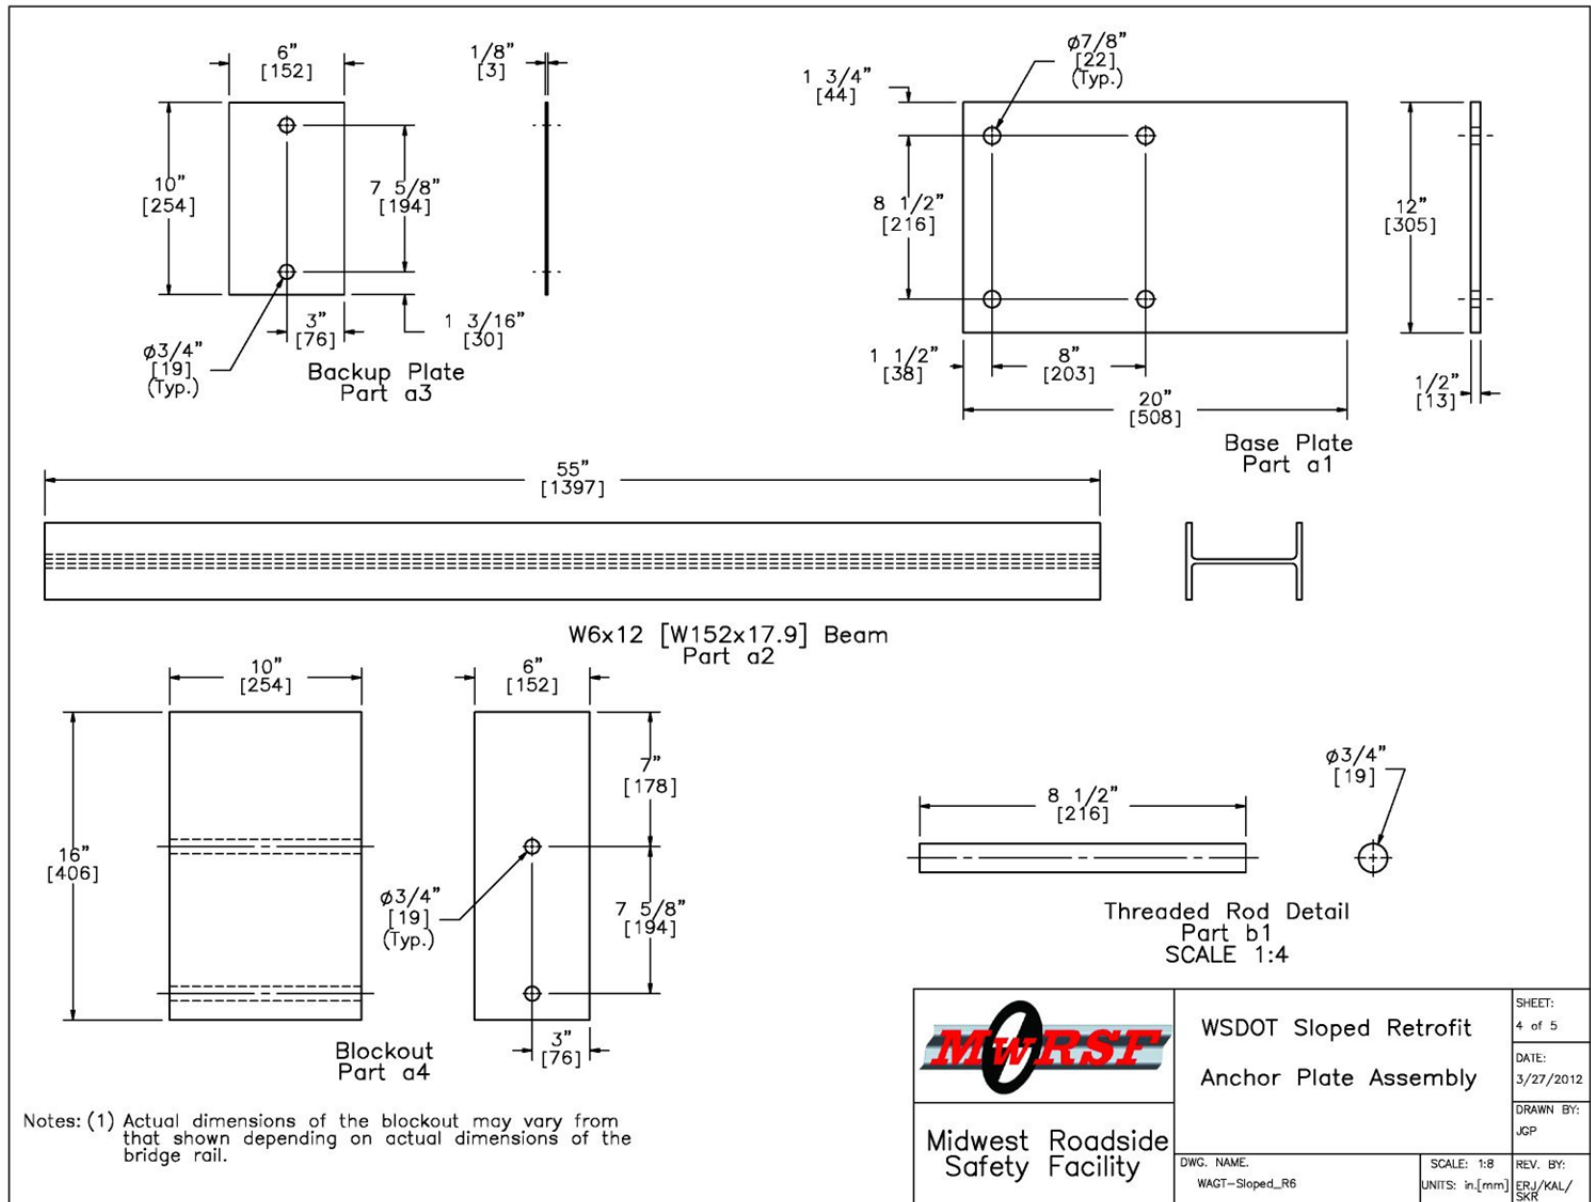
Retrofit 1 – Sloped-End Anchor Plate Assembly
